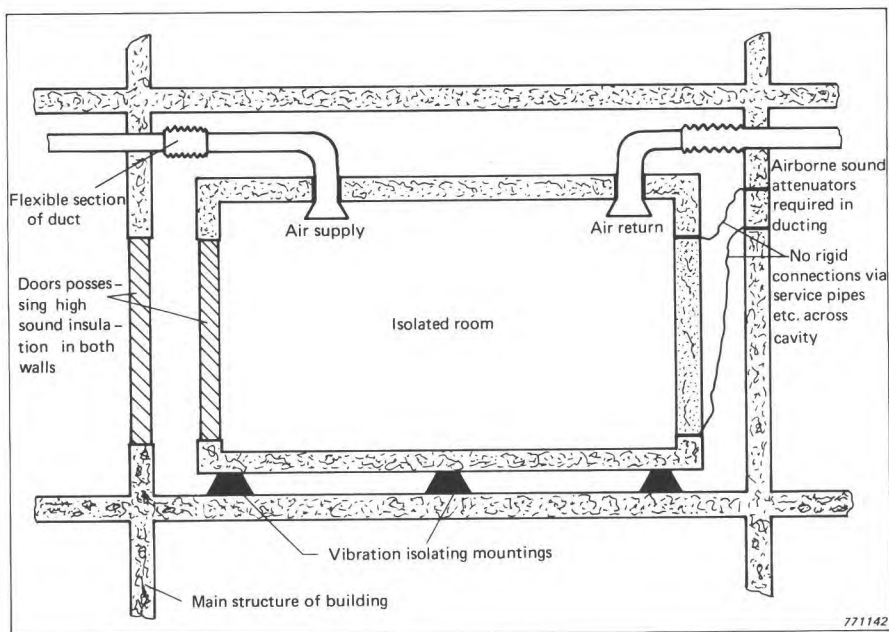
Discontinuous construction: vertical section through an isolated room
